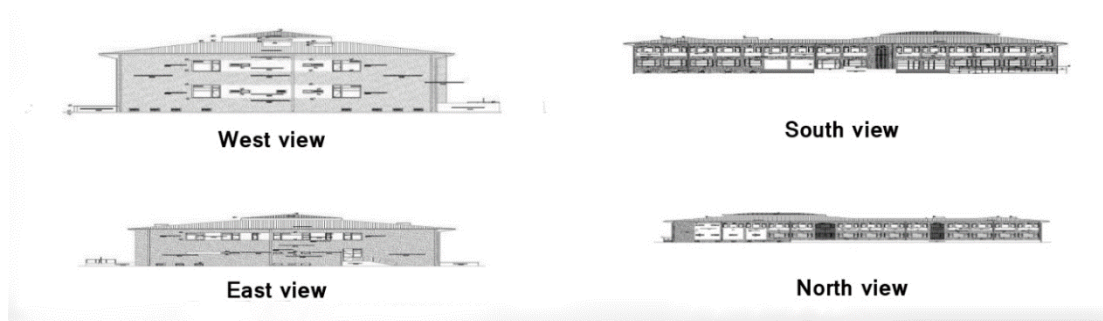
West, east, north, south elevations of - Primary School with 12 Classroom – type project
